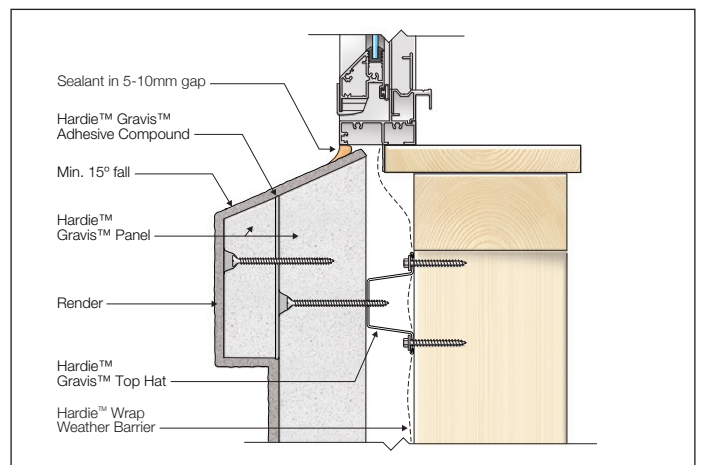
ALTERNATIVE SILL TREATMENT DETAIL
